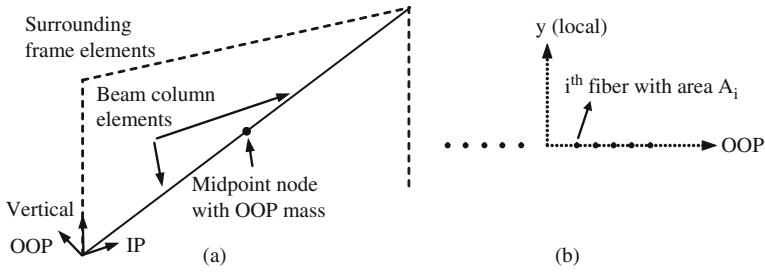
(a) Utilized infill wall model, (b) fiber layout in the cross-section
